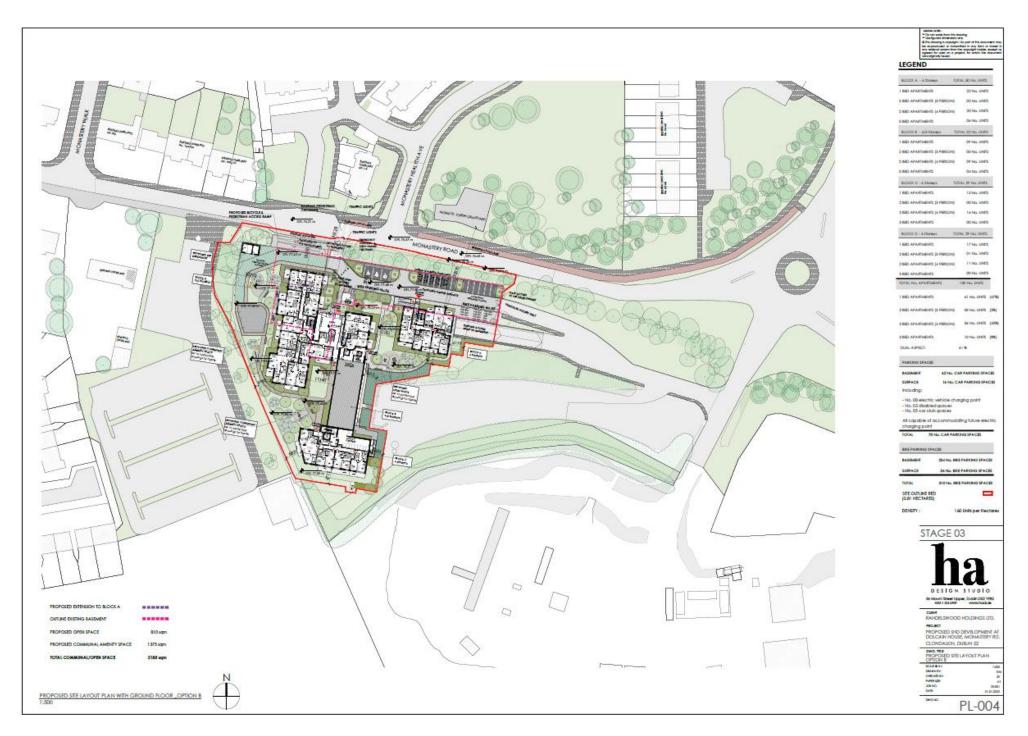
Proposed site layout plan – Option B (excl. footpath)
